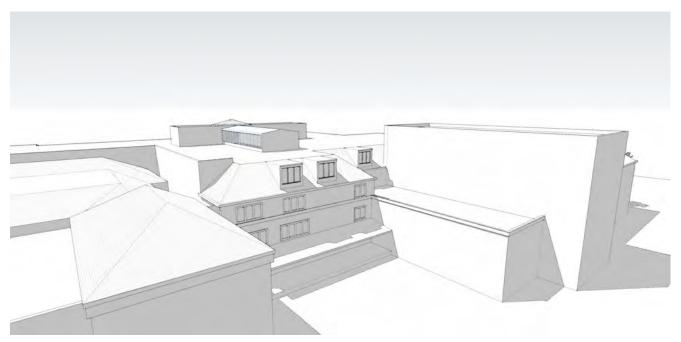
View from north showing potential adjustments to HSSE roofline -- adding dormer windows, clerestory for daylight in Level 4 and a skylight over the central stair.
